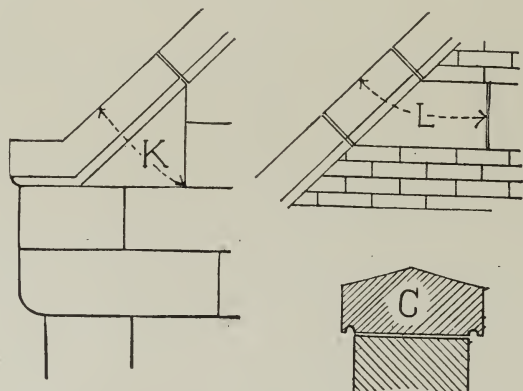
Stone Copings. K. Gable Coping Kneeler.
